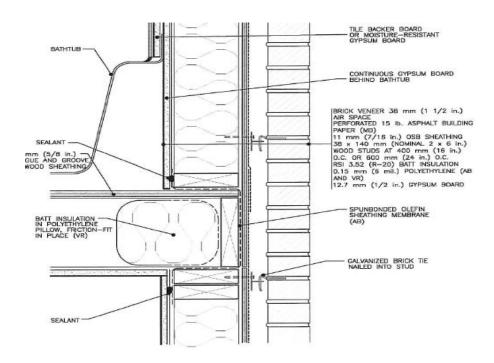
Typical Exterior Wall Section of North American Home (Source: CMHC, 2004)
